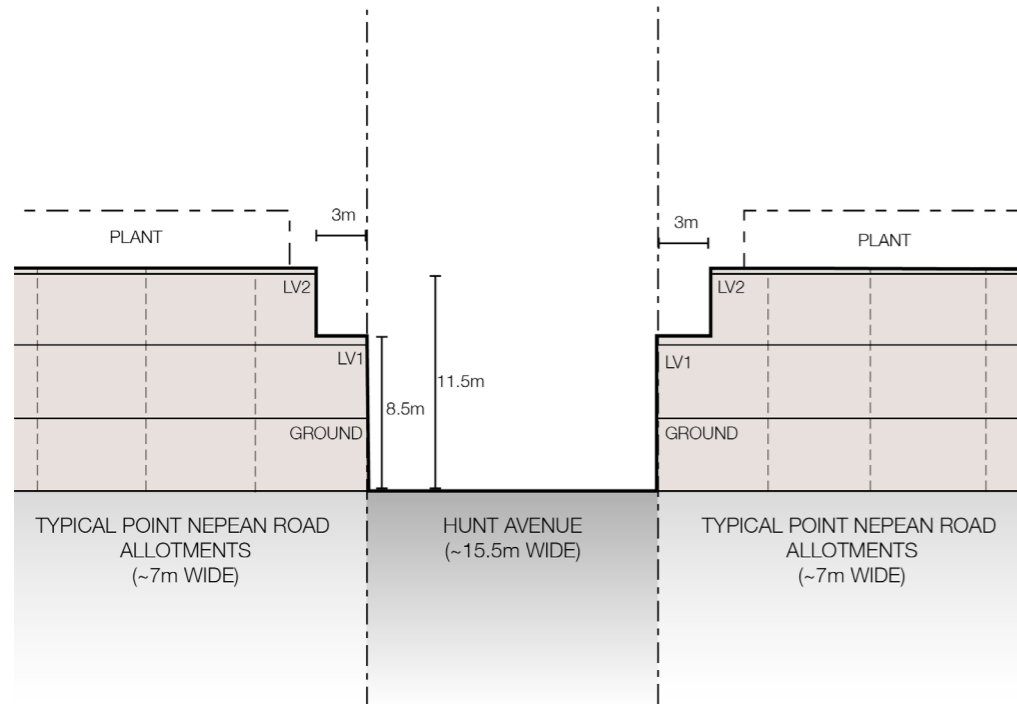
(left) -Section diagram of a typical 'side street' built form response (in this case to Hunt Street) showing the massing of height above a preferred double storey street wall.
